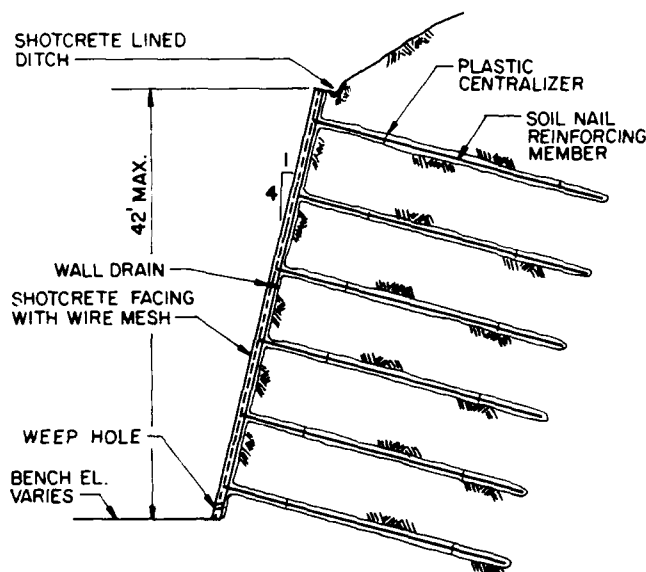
SOIL NAIL WALL SECTION, CUMBERLAND GAP (NICHOLSON, 1986)
